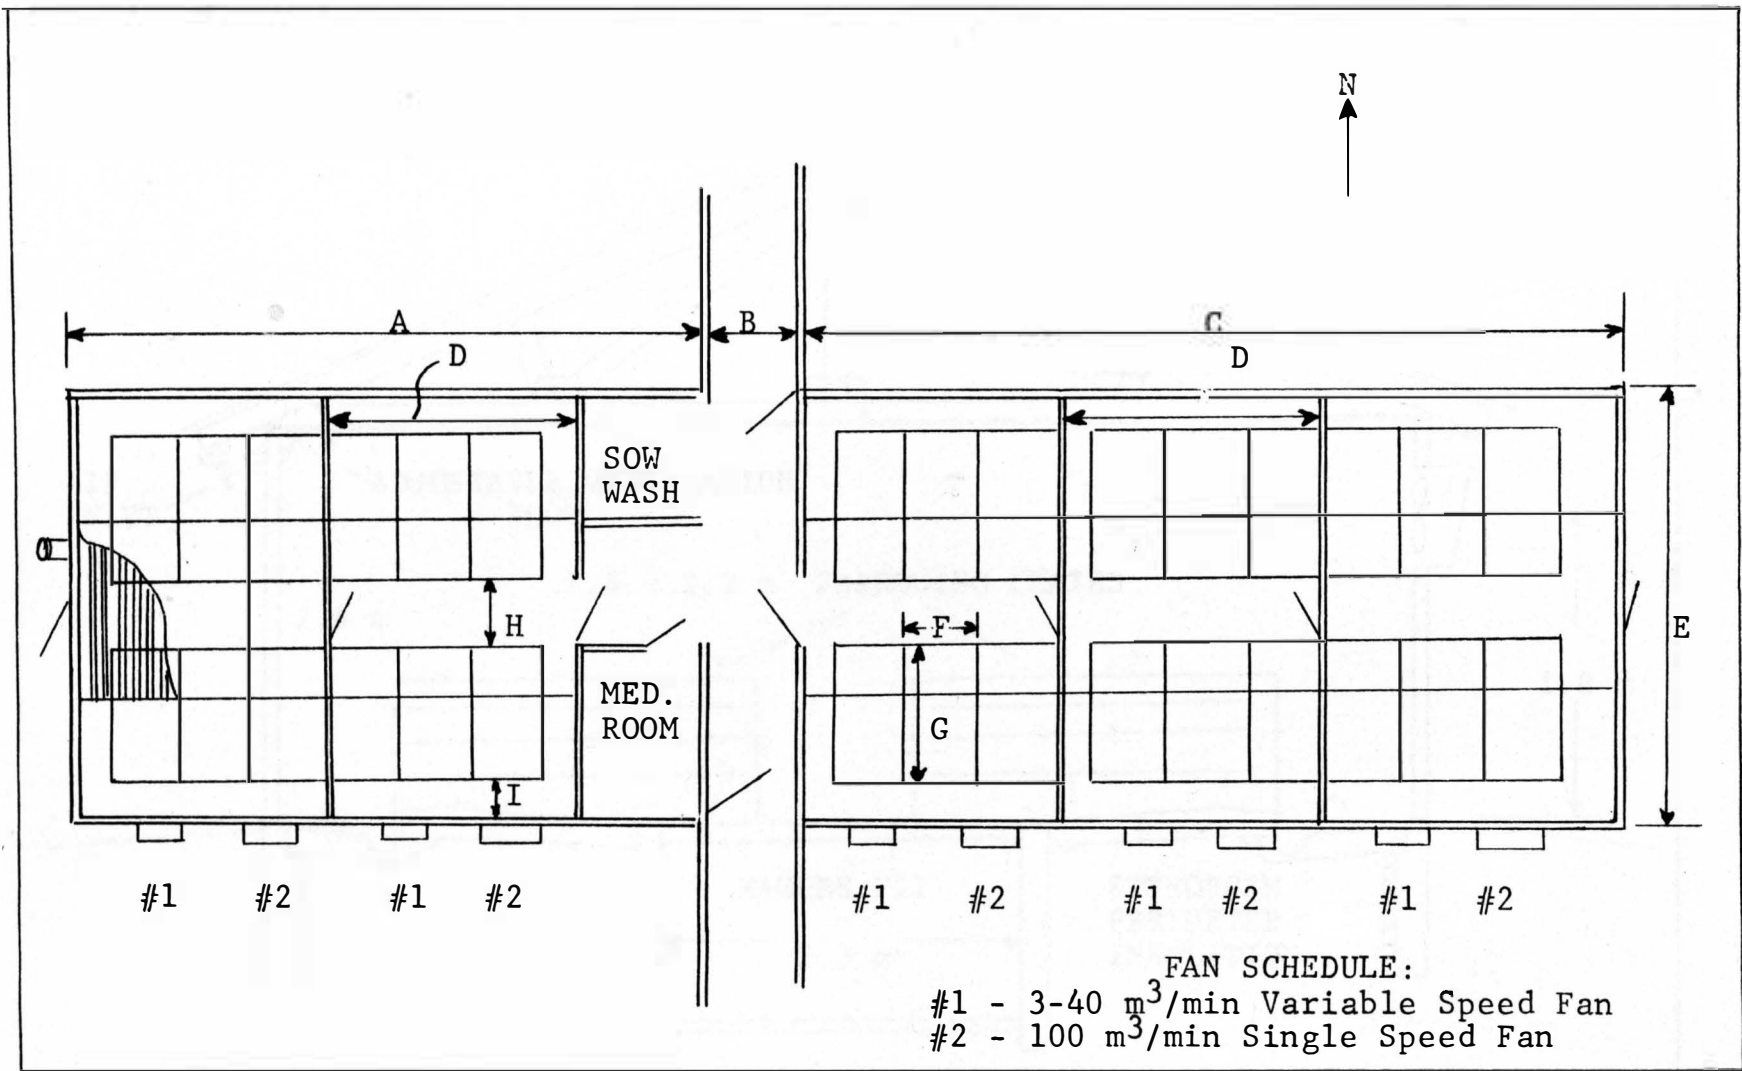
PLAN VIEW OF THE FARROWING FACILITY.
